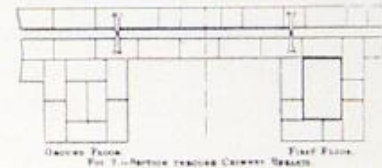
SECTION SHOWING CHIMNEY BREAST.
